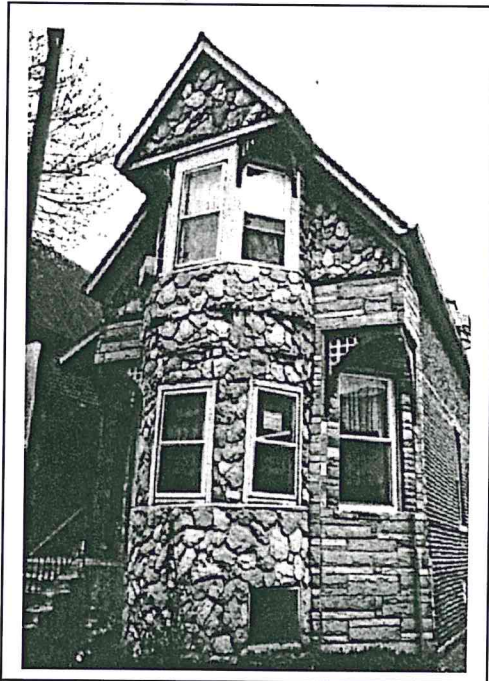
Exterior Walls – Horizontal Seam Treatment
